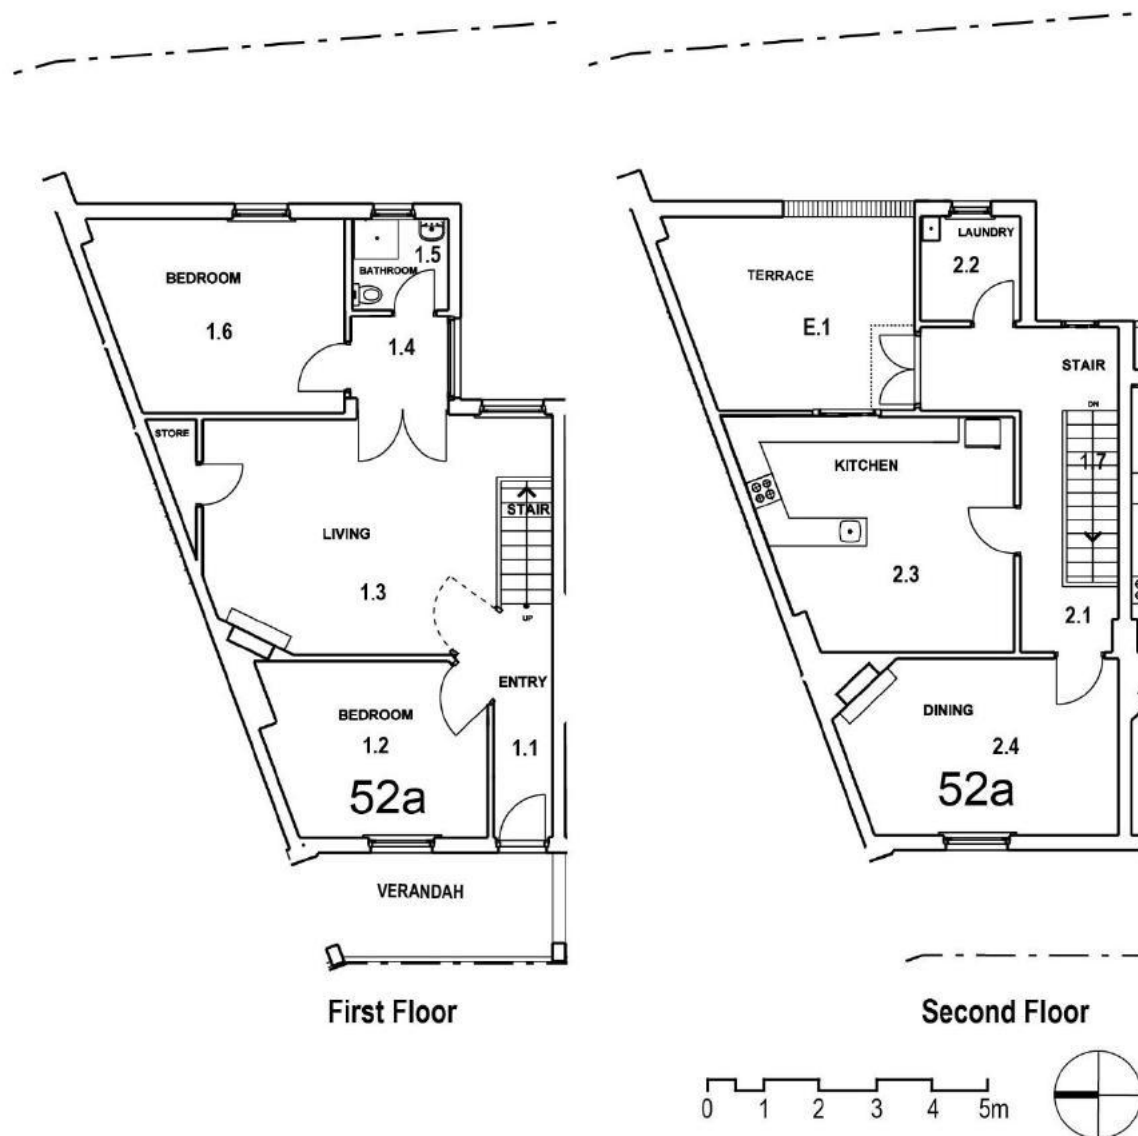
Floor plans of Flat 52A / 46–56 Gloucester Street showing layout of flat and space numbers, for the first and second floors. (Source: LAHC, with GML overlay 2016)
